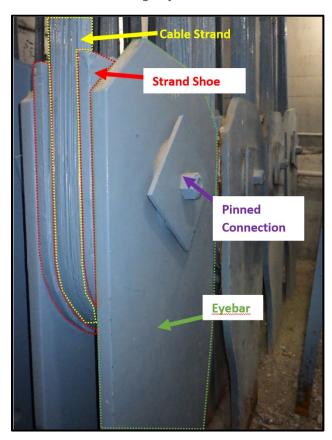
Strands, Strand Shoes, and Anchorage Eyebars in Northeast Anchorage Chamber
